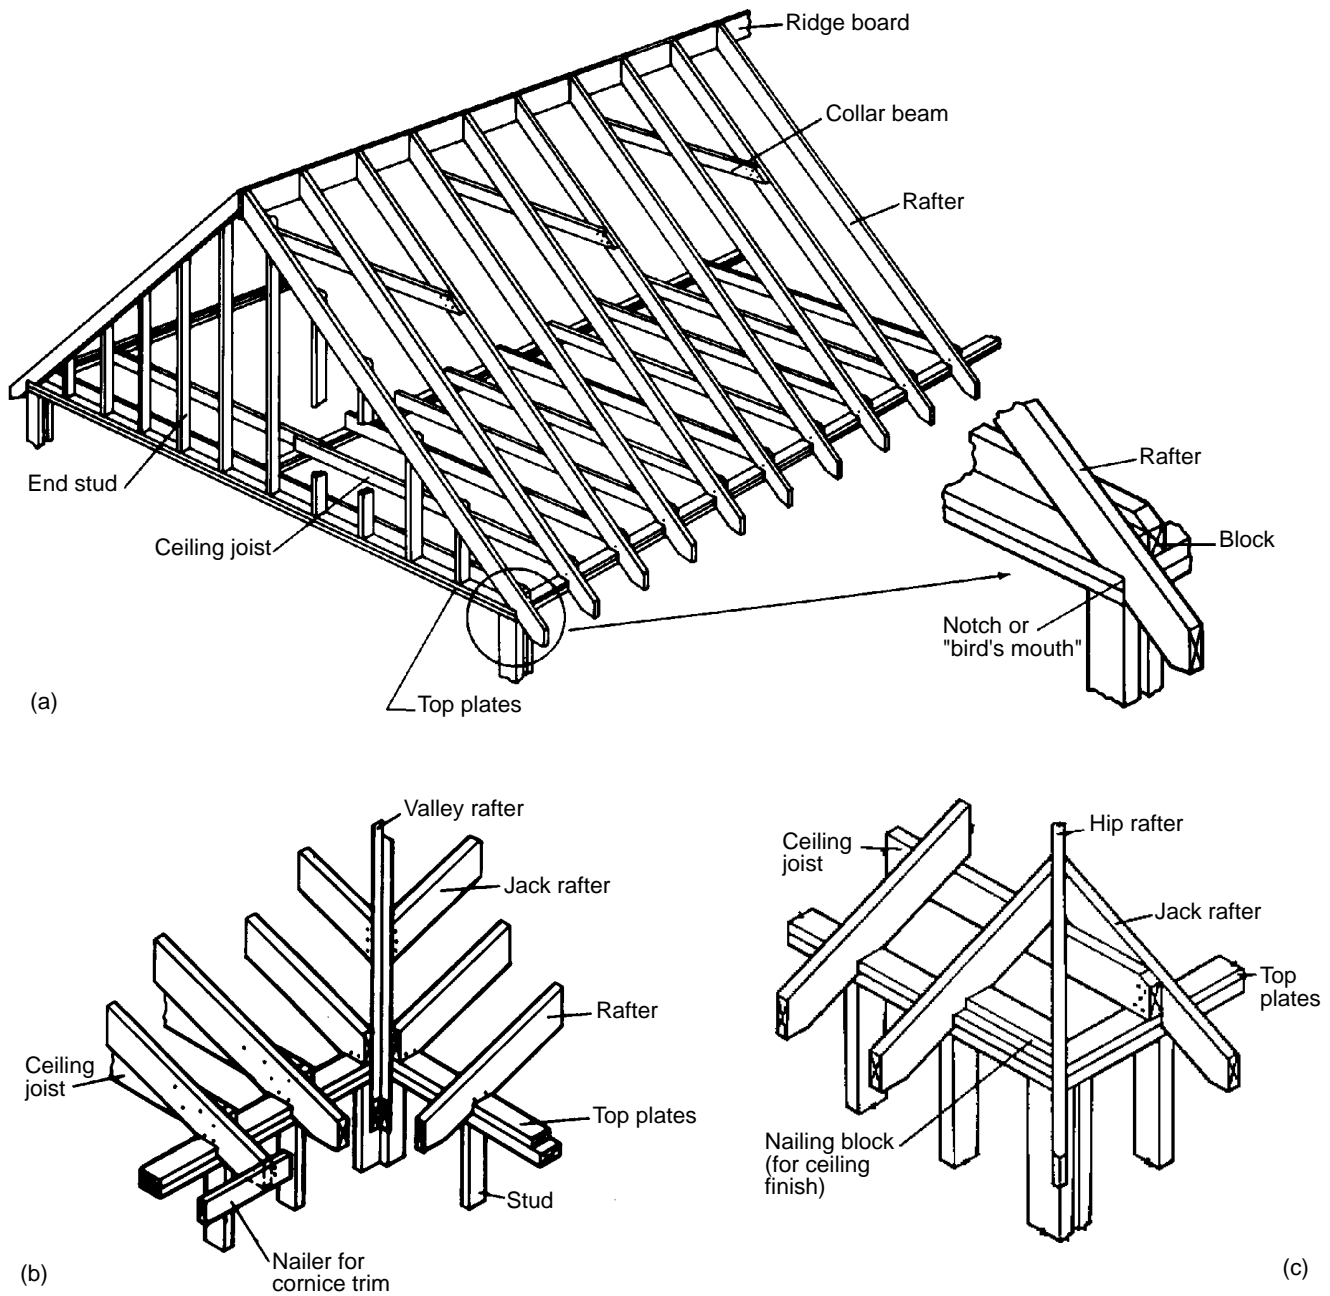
(a) A rafter-type roof with typical framing details for (b) a valley and (c) a hip corner.
